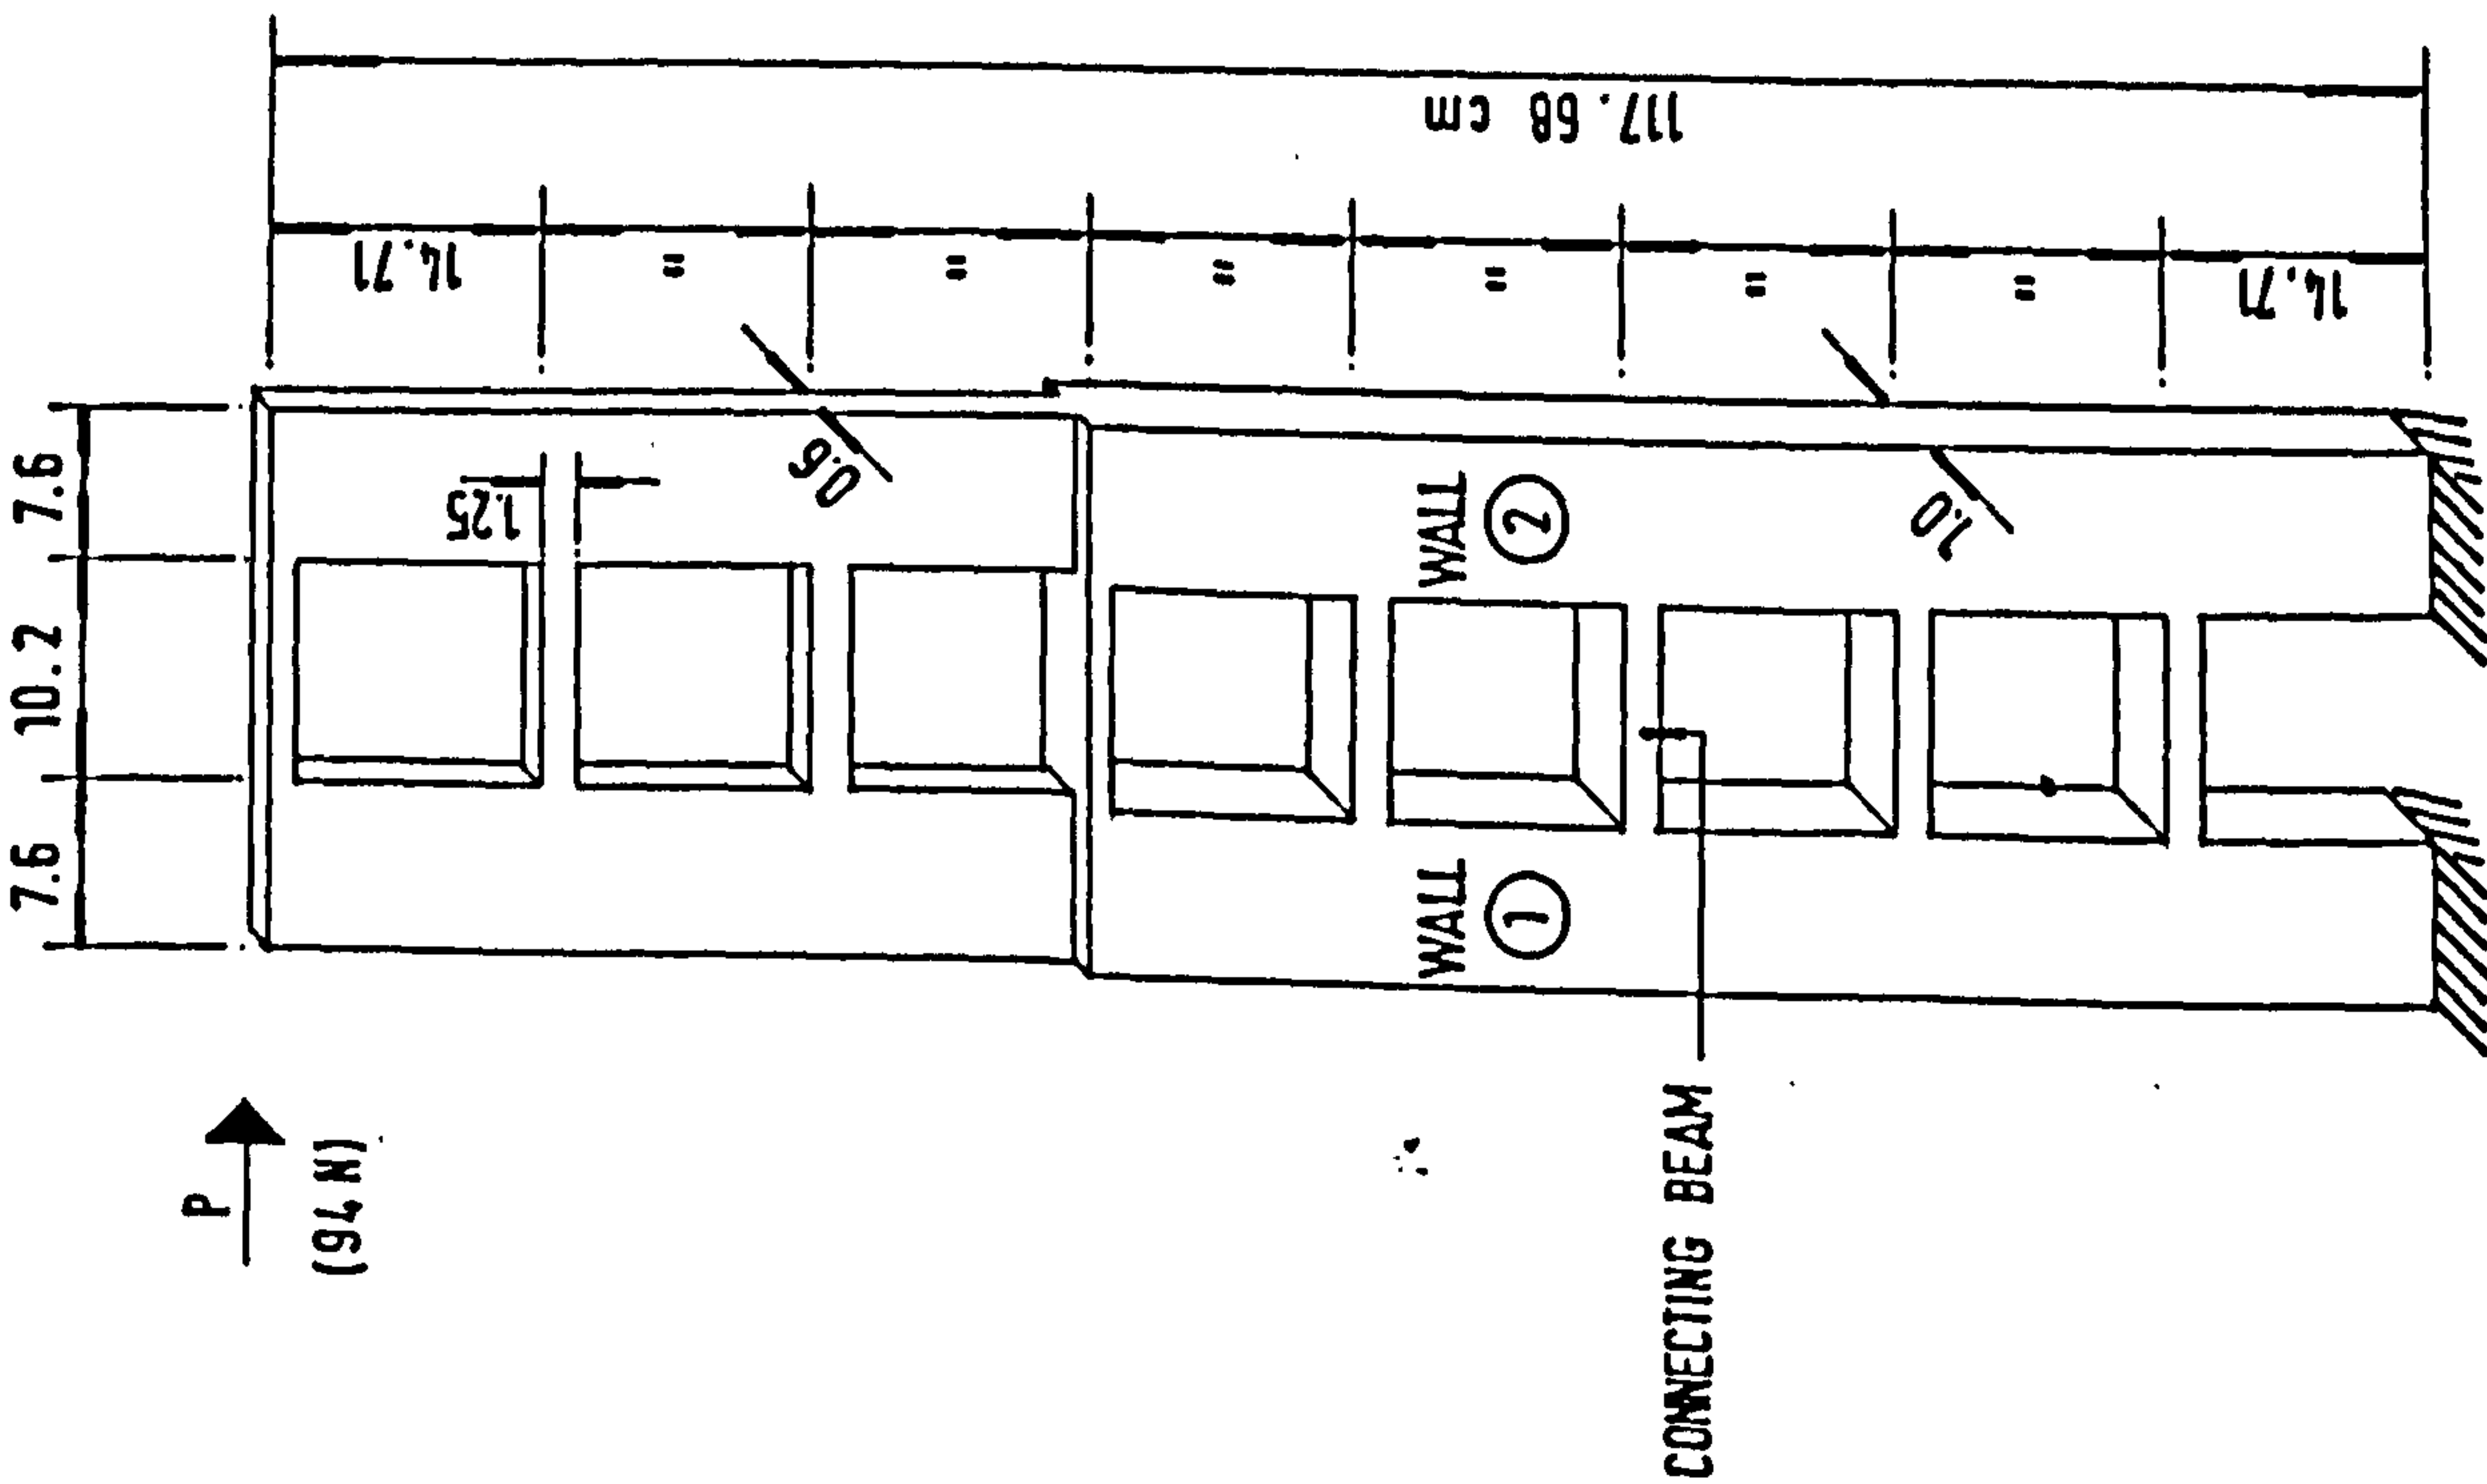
COUPLED SHEAR WALL MODEL ⑬
